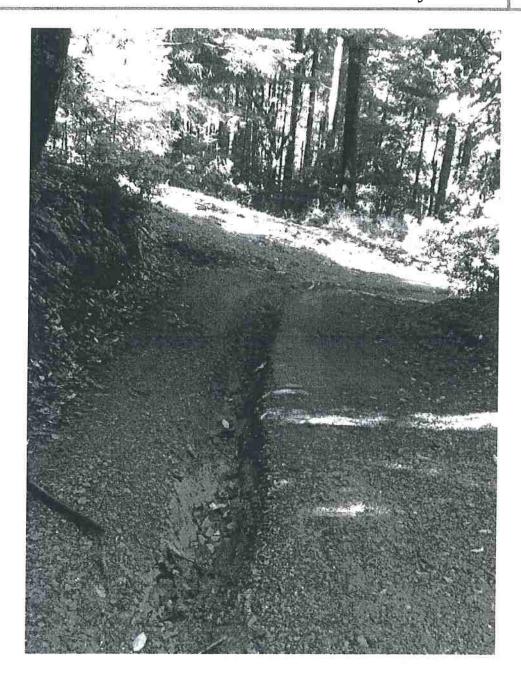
Degraded road with significant rutting. Photo date 1-24-17
